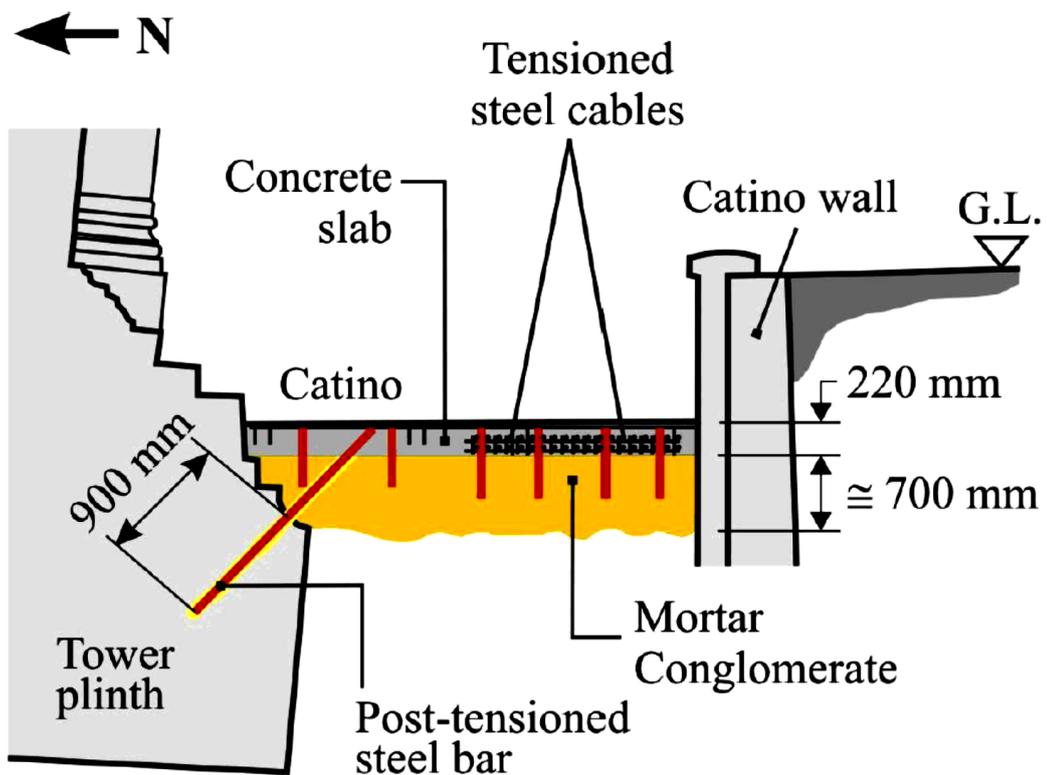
Illustration of structural connection of concrete ring with tower foundation (Burland et al. 2009)
